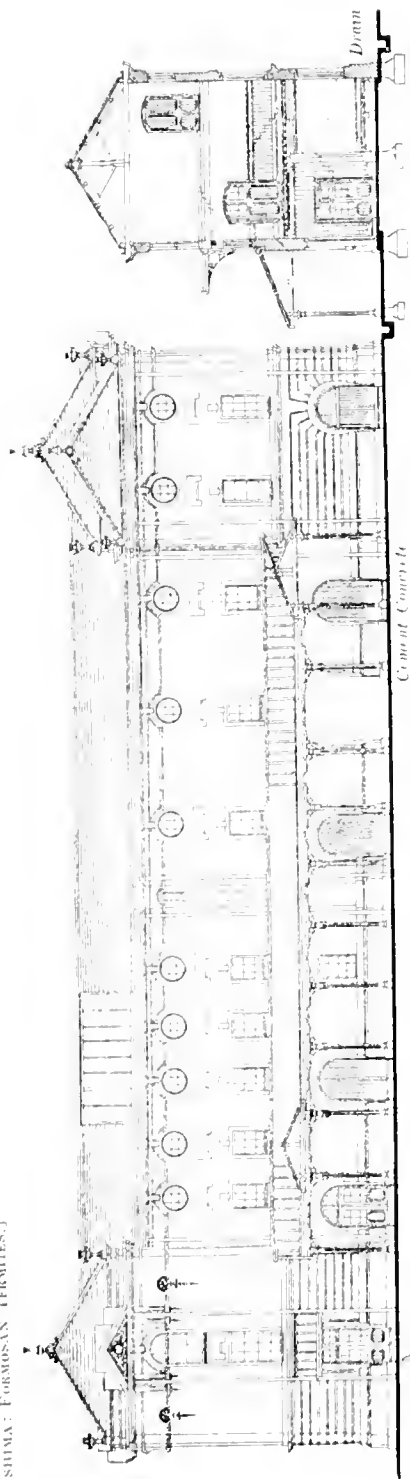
PLATE XII. EXAMPLES OF TERMITE-PROOF BRICK BUILDINGS.
